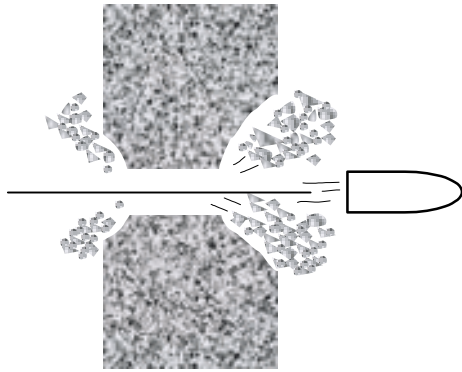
Spalling and scabbing, based on FortHI (1987). Spalling in the front of the concrete wall and scabbing at the backside of the wall.
